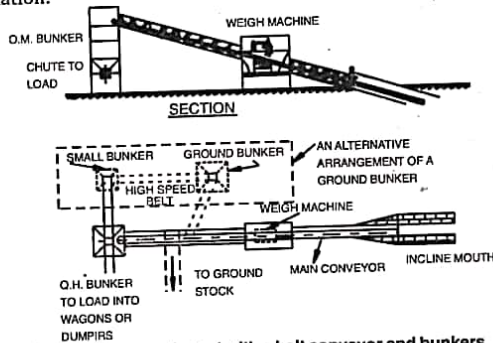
Incline-top layout with a belt conveyor and bunkers.
